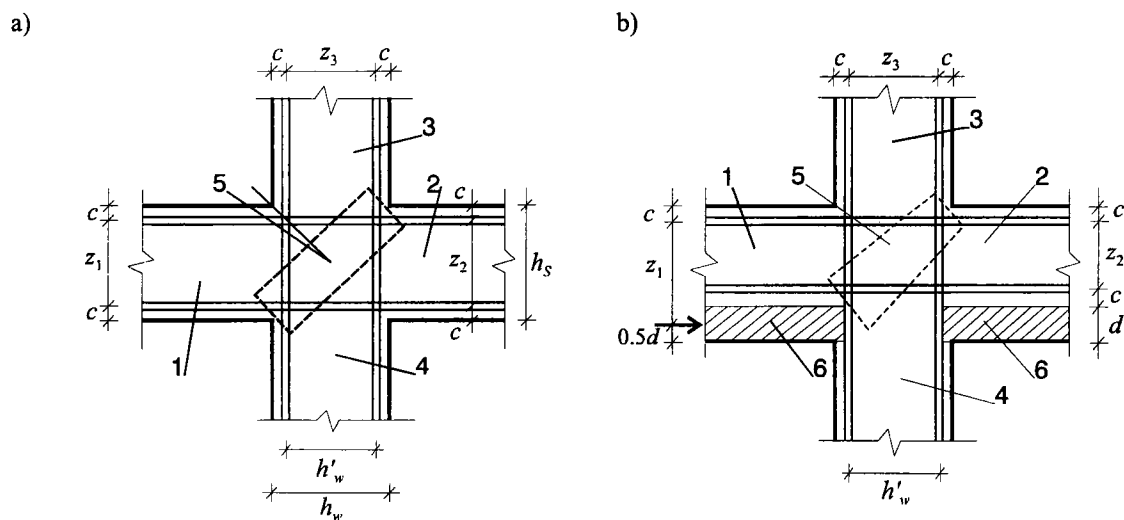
Elevation of slab-wall joints with floor slabs cast on split moulds (a) and precast reinforced concrete slabs (b):
